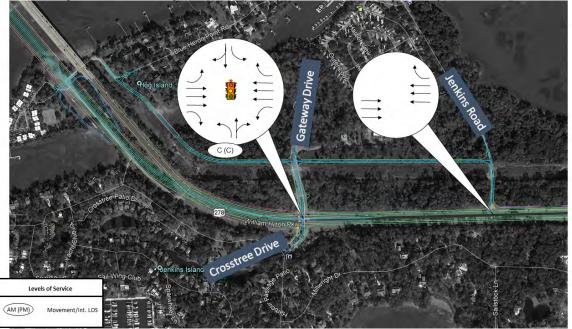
Full Access Signal at Gateway Drive/Crosstree Drive and Right In/Right Out at Jenkins Road
